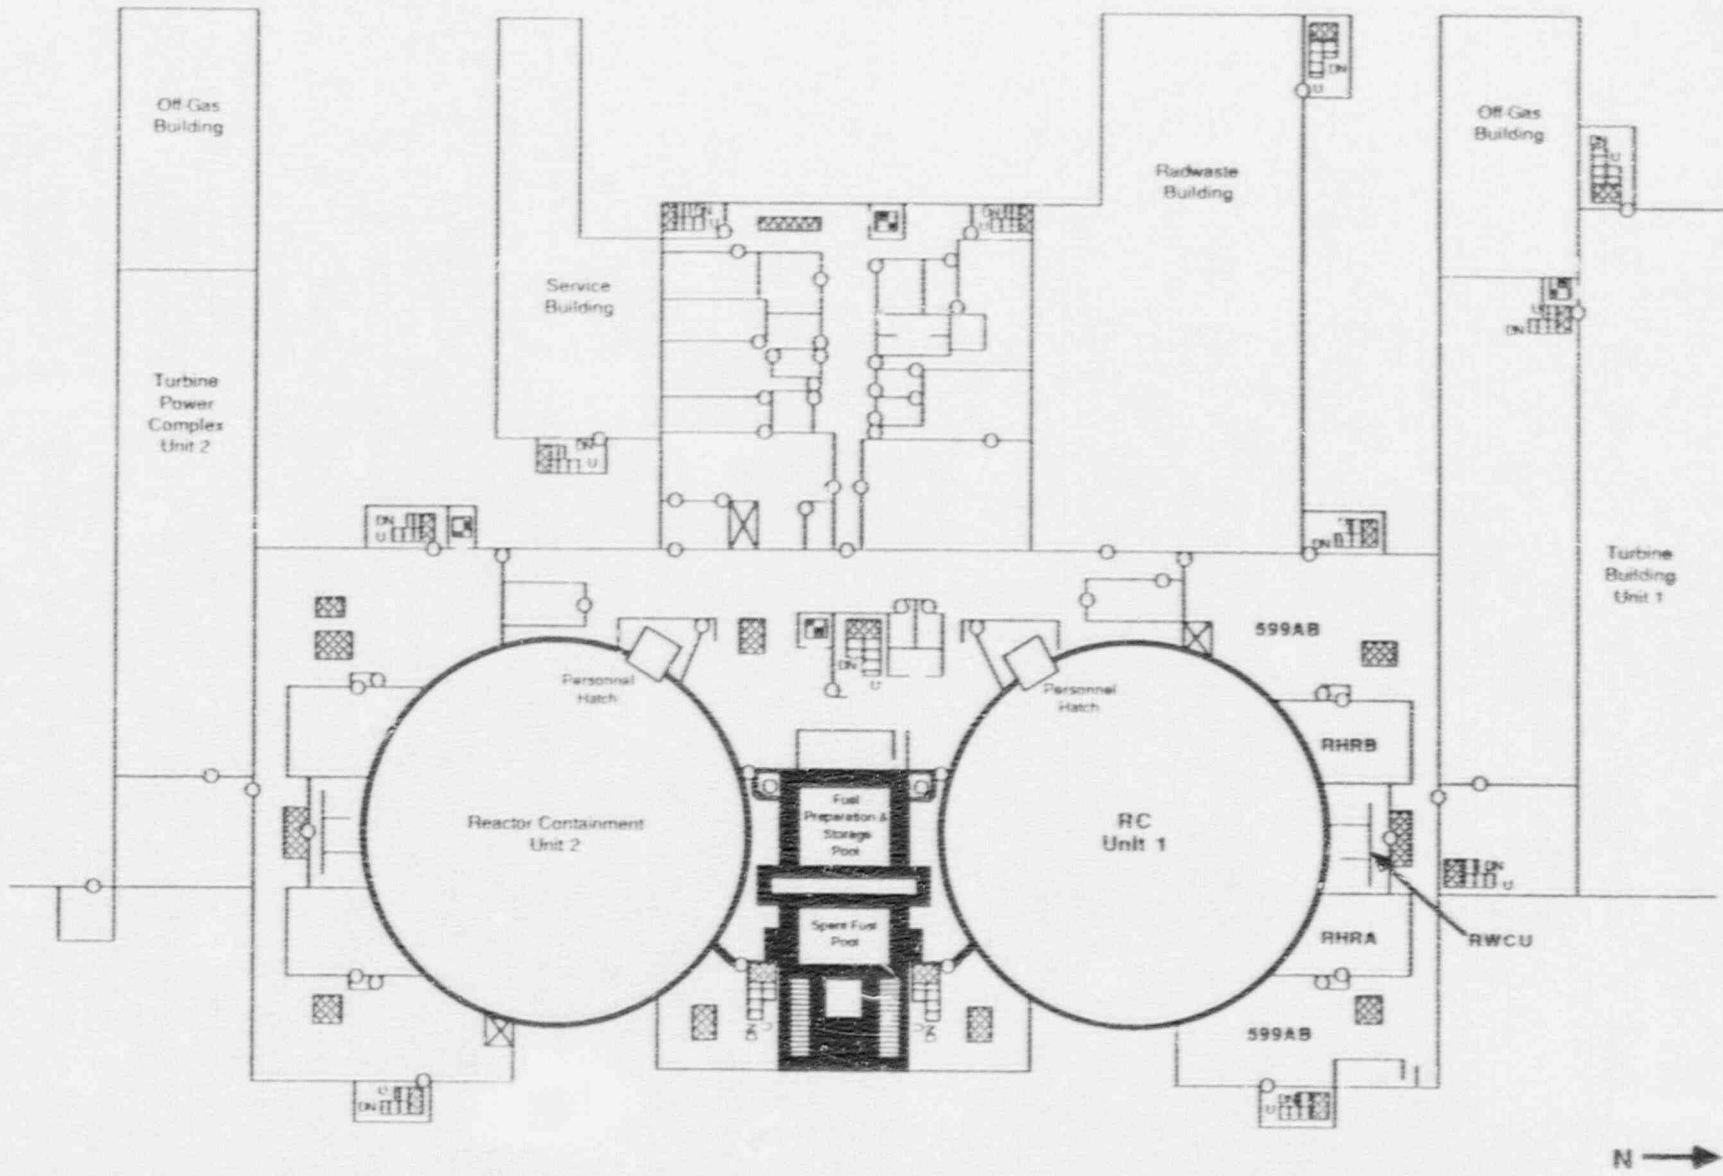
Perry 1 and 2 Reactor Building, Auxiliary Buildings, Intermediate Building, Control Complex, Elevation 599', and Turbine Power Complex, Elevation 593'6"
